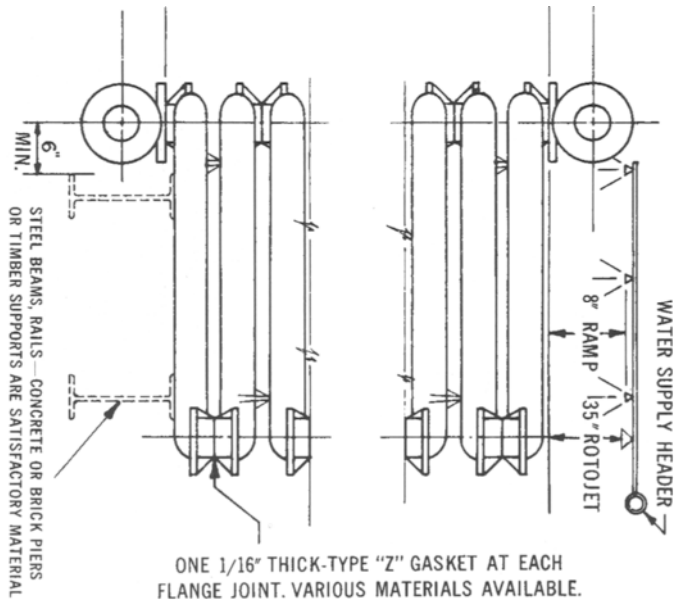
B. Elevation assembly—cast iron cooler sections.
